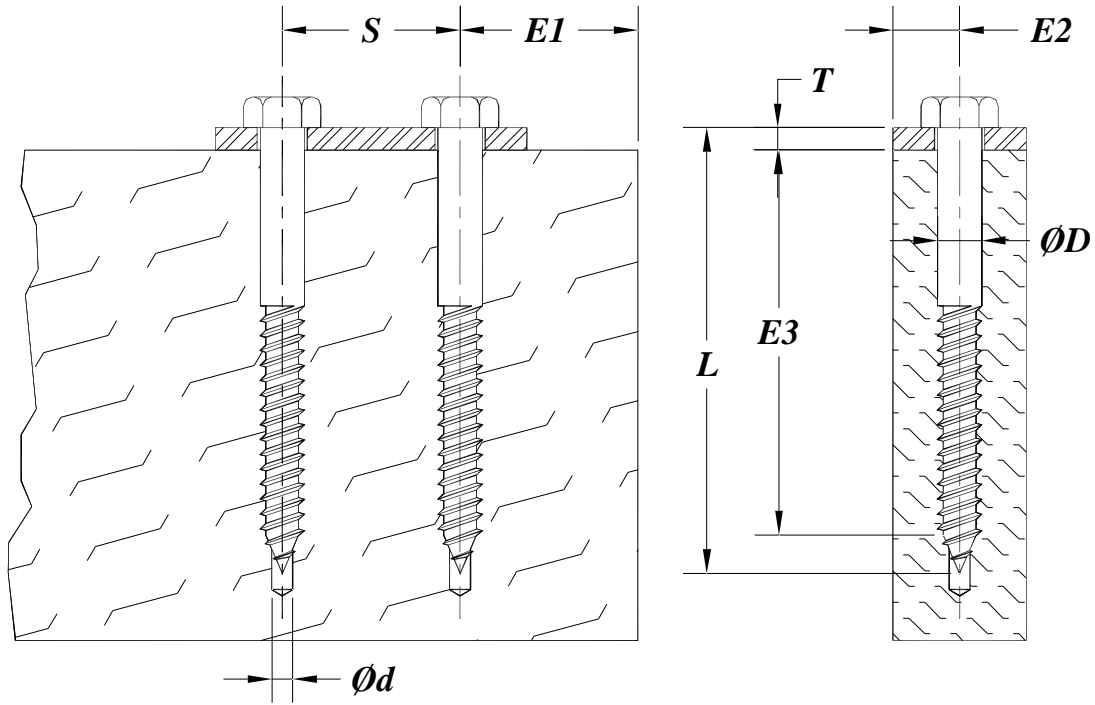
; Typical Lag Screw Installation Dimensions
